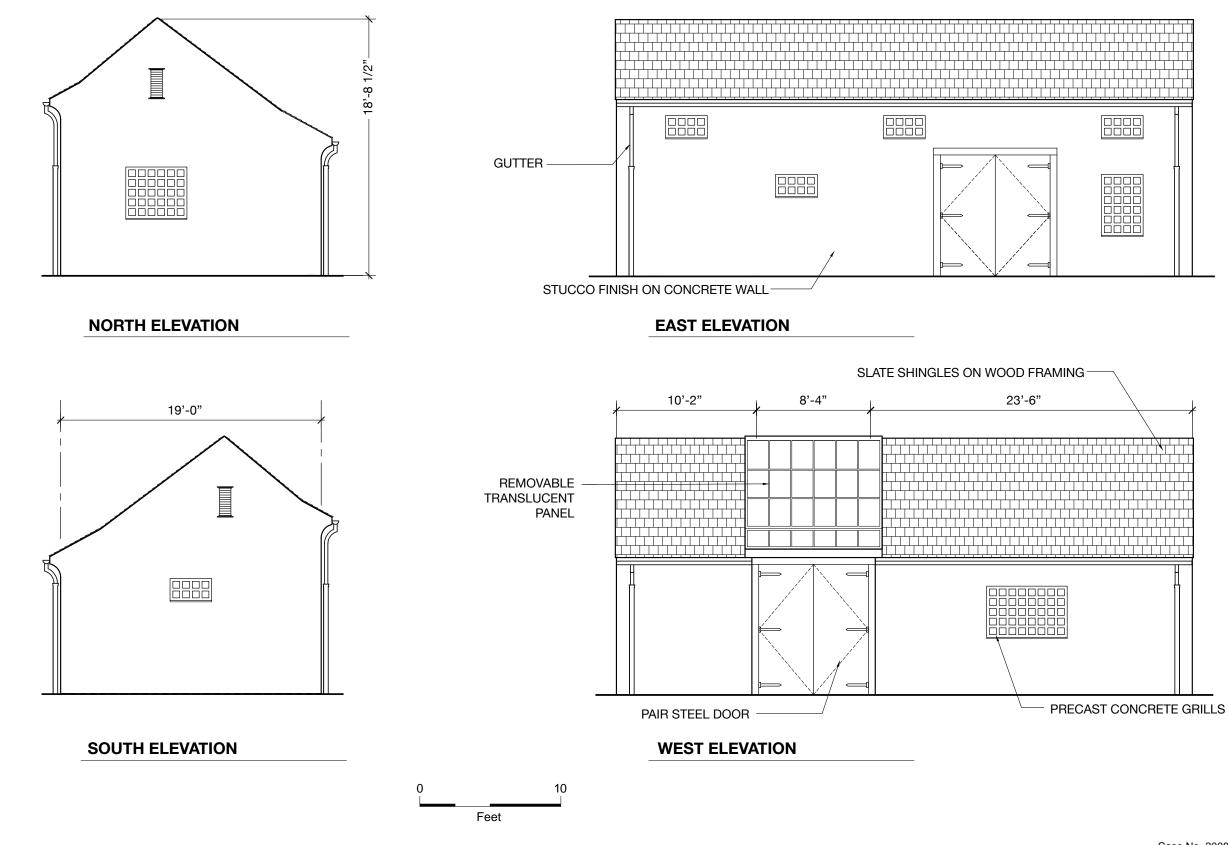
Lake Merced Well Facility -Proposed Building Elevations
